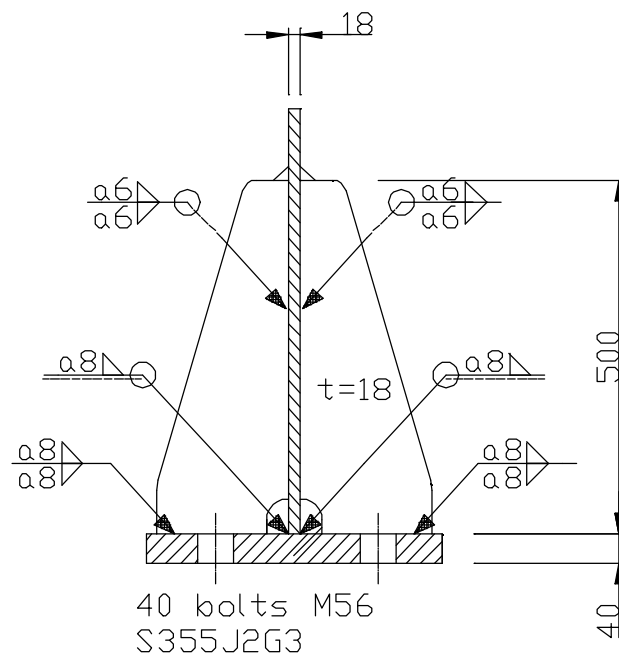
d Original base details with 40 gusset plates symmetrically at inside and outside of the shell plate. 2x40 bolts M56 S355J2G3 (Details of the later modified foundation ring are shown in Figure 2.1 g).
